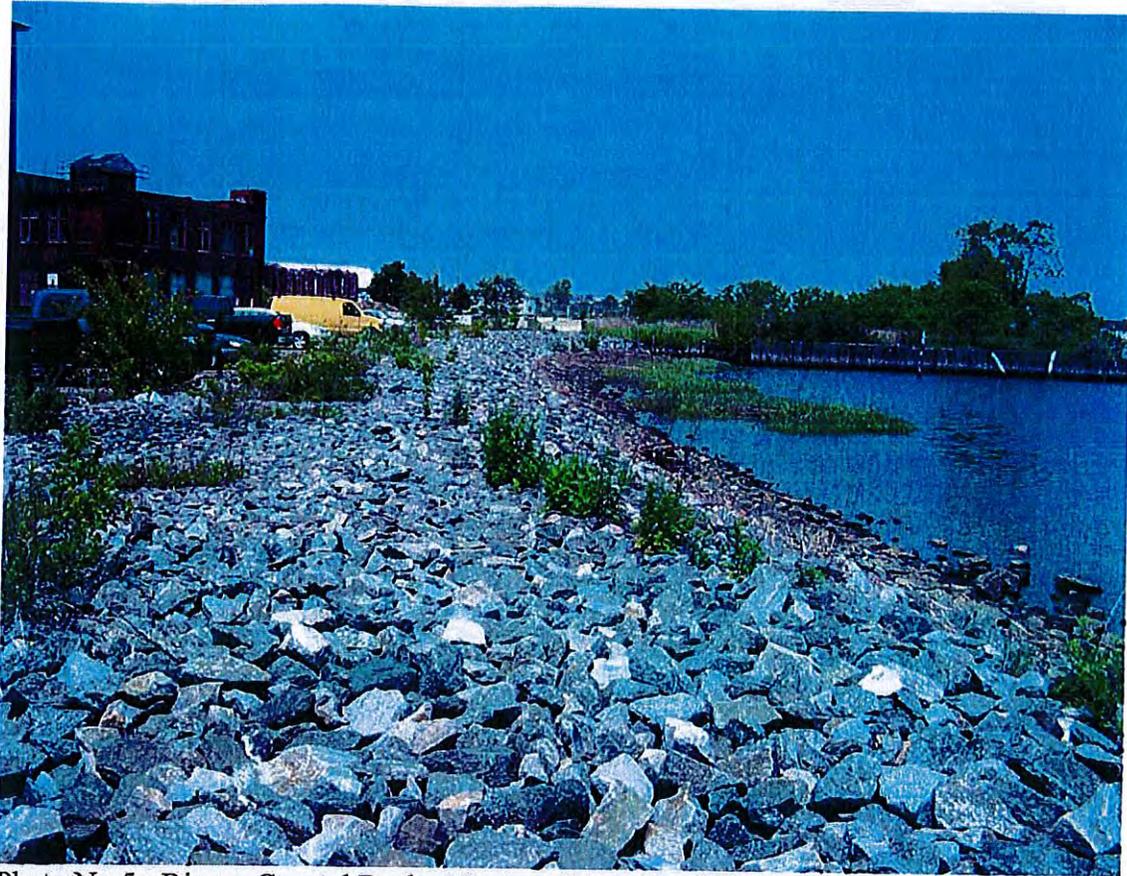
Riprap Coastal Bank at Sawyer Street Outfall
